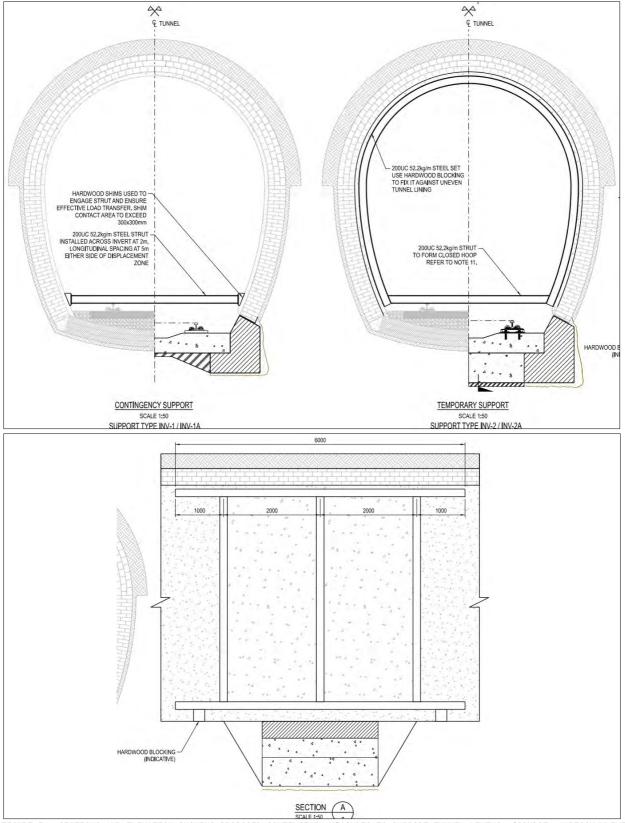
SECTIONS AND ELEVATION SHOWING PROPOSED CONTINGENCY MEASURES TO SUPPORT TUNNEL LINING. (SOURCE: AURECON/VLINE)
